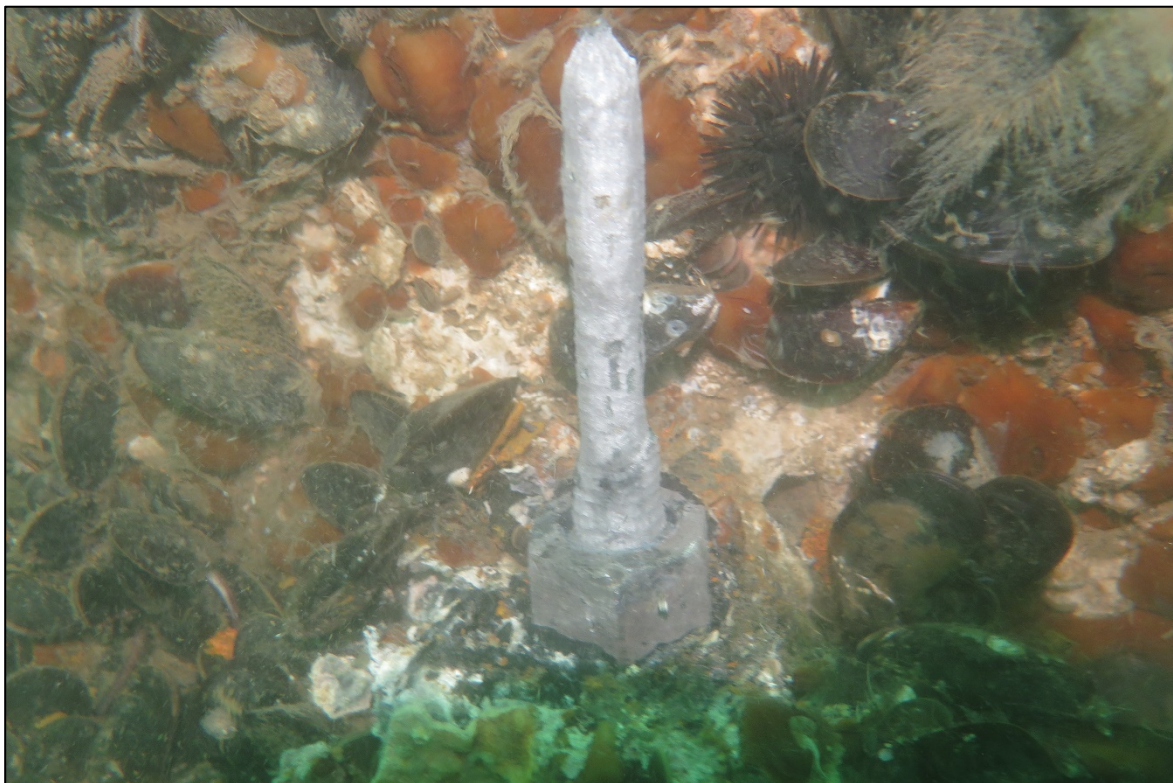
Typical condition of soft anchor bolt and nut located on northwest anchor bolt on the Diffuser E52.
